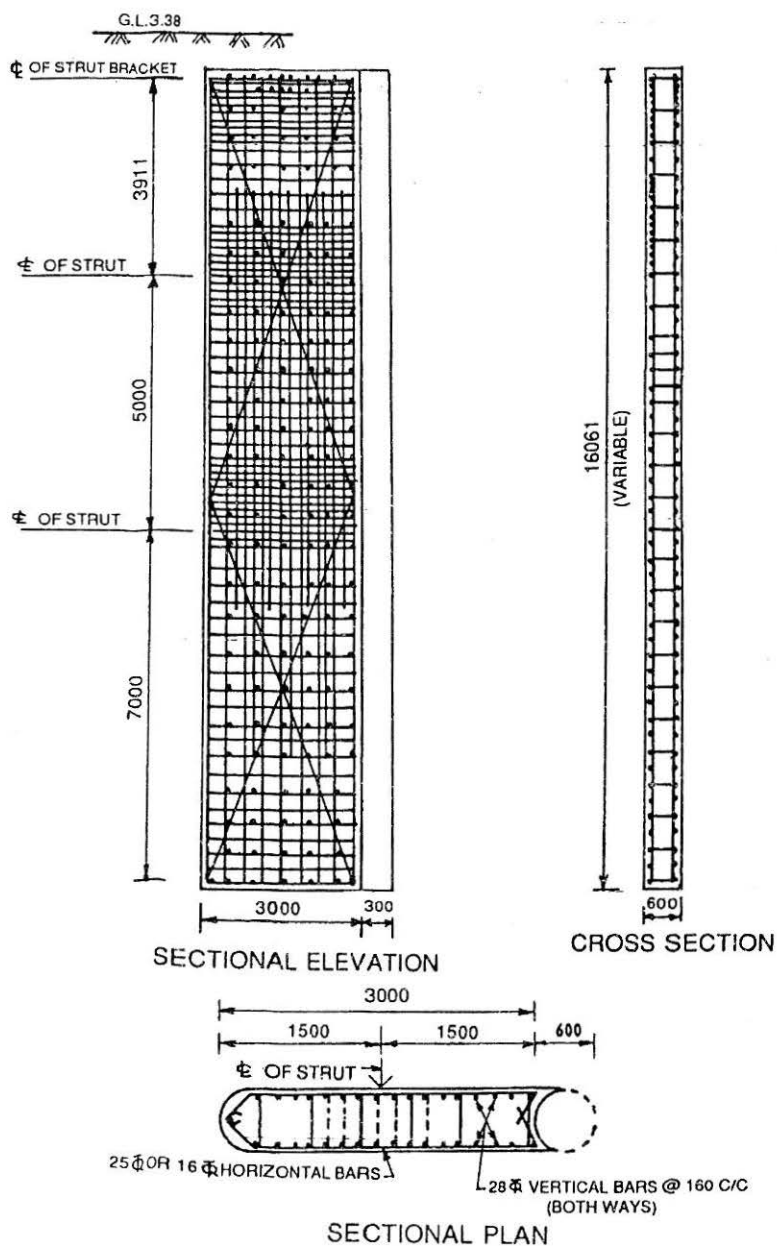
Reinforcement Cage of Diaphragm Wall
